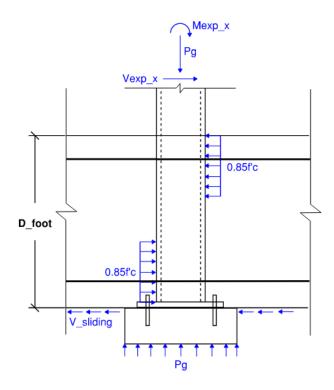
Forces at embedded column that is not near the end of a grade beam.
